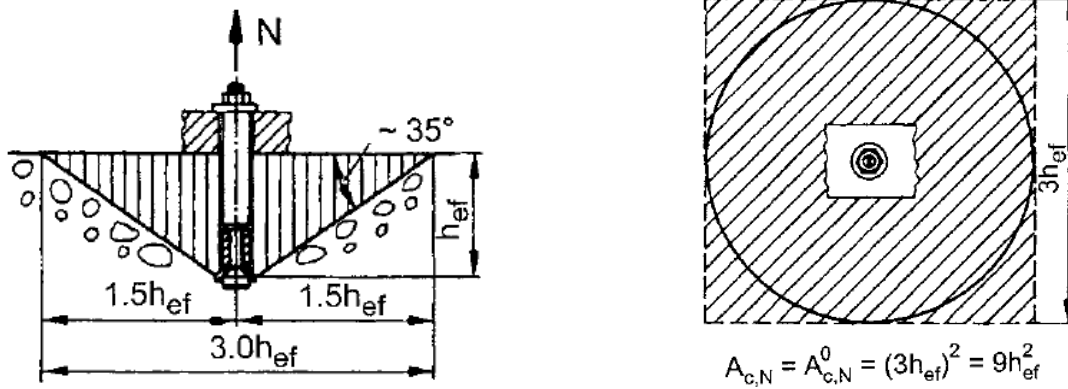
Concrete cone failure surface (Eligehausen et al., 2006).
